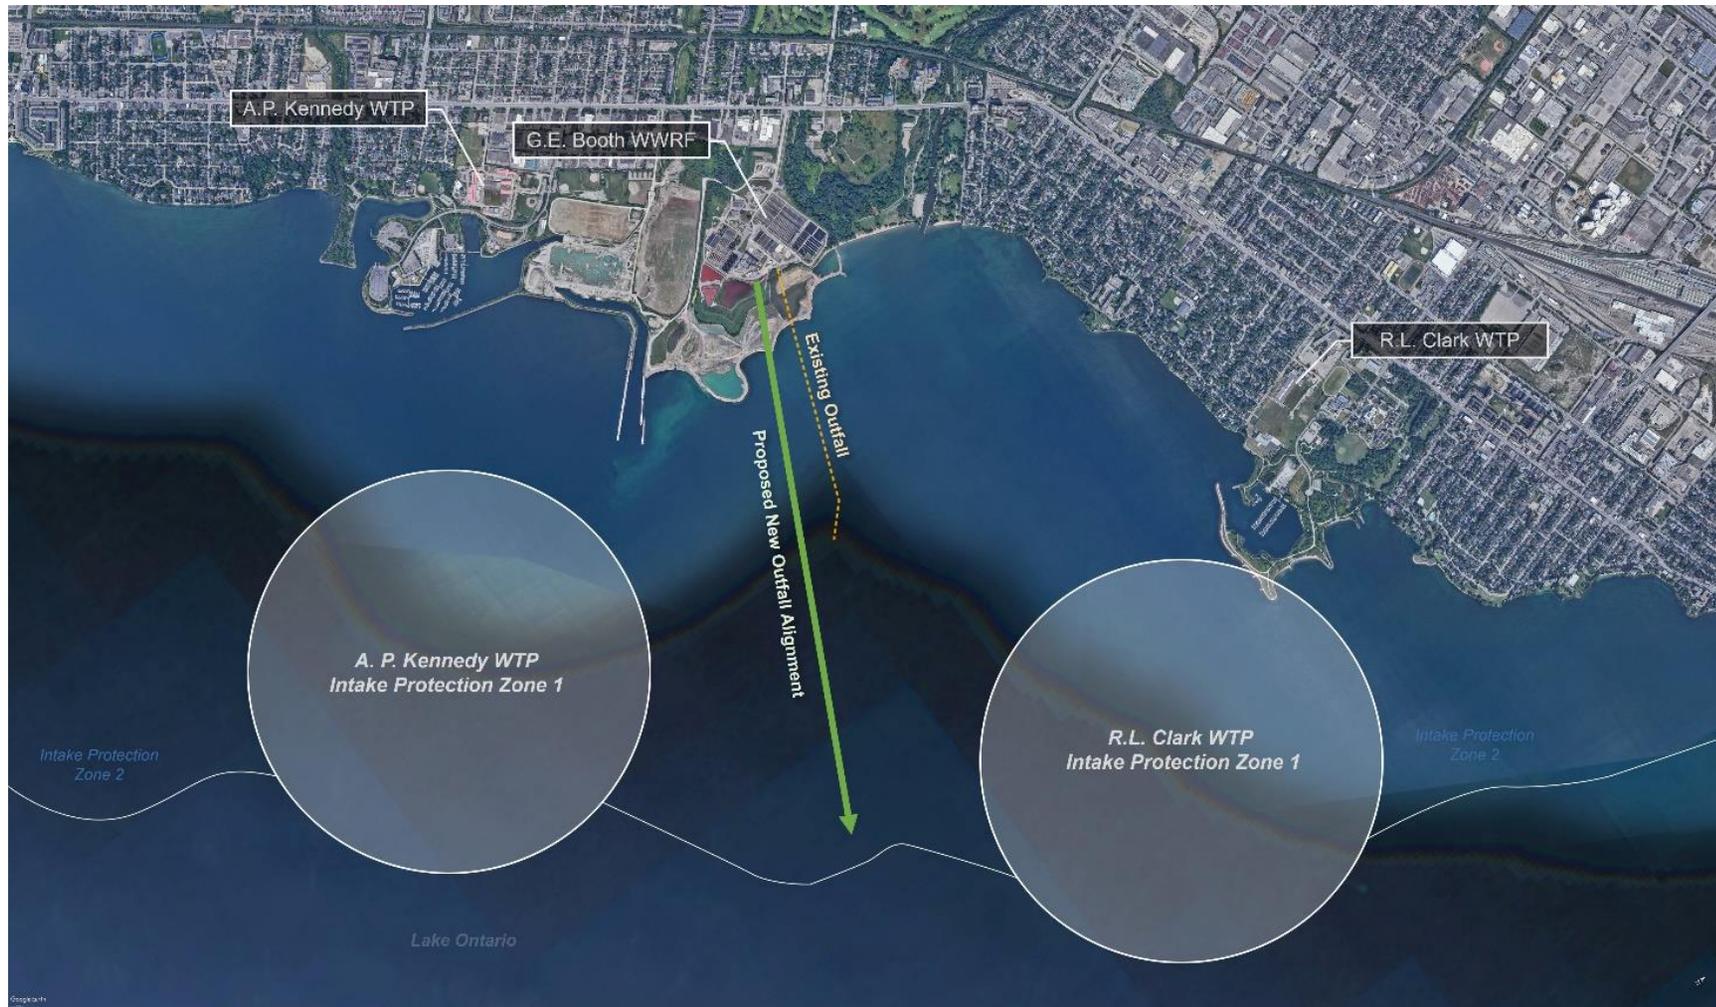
Recommended Outfall Tunnel Alignment - Plan View
